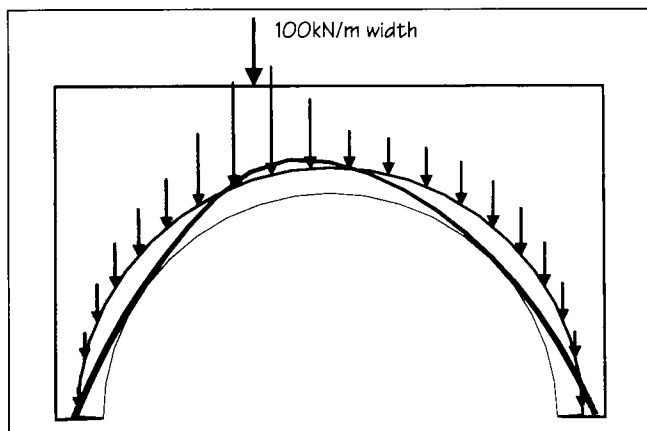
Fill acting as dead load only, negligible capacity, for bridge at Bargower.
